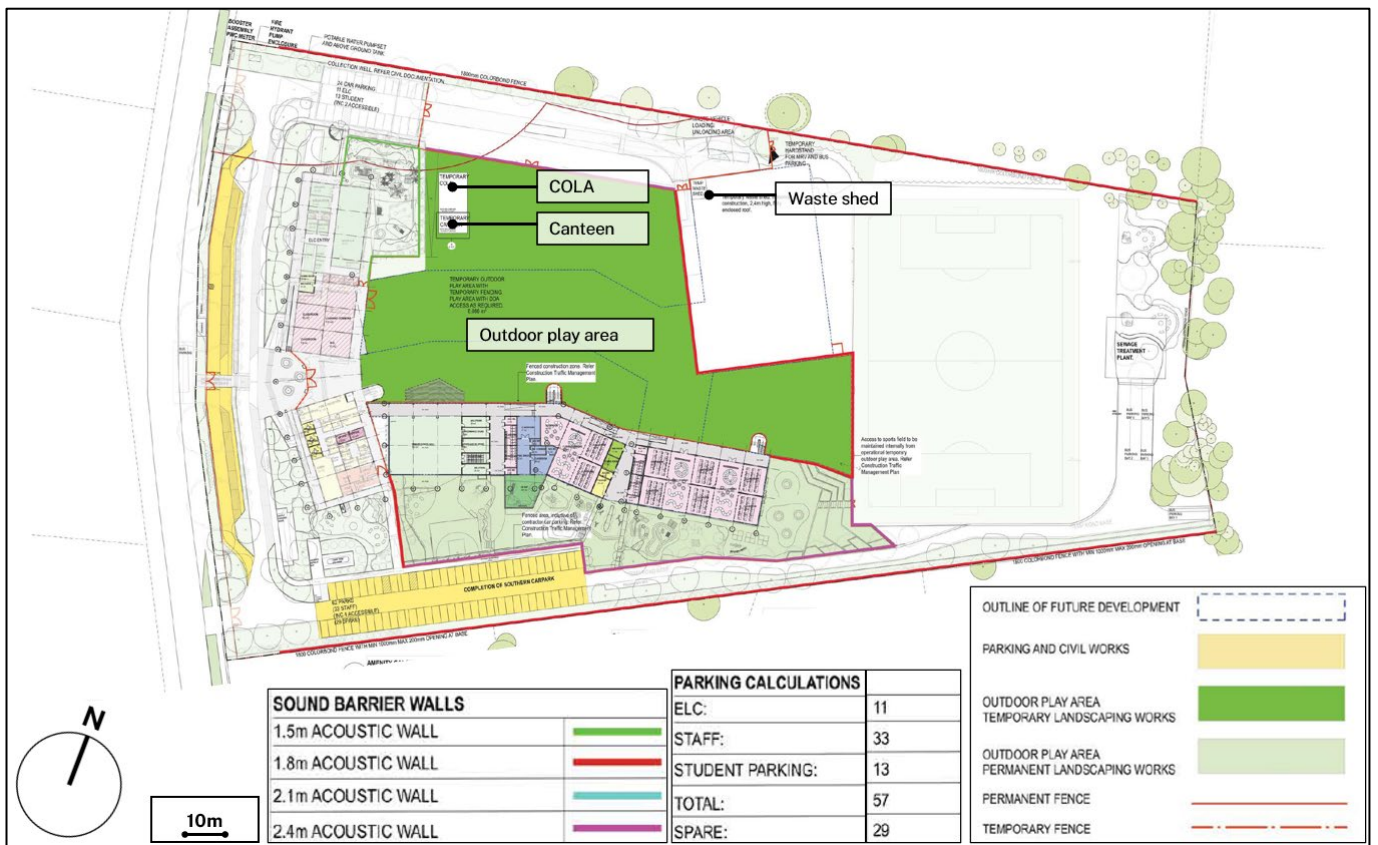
| Stage 2 Ground Floor Plan (Source: Applicant's AR, 2024)
